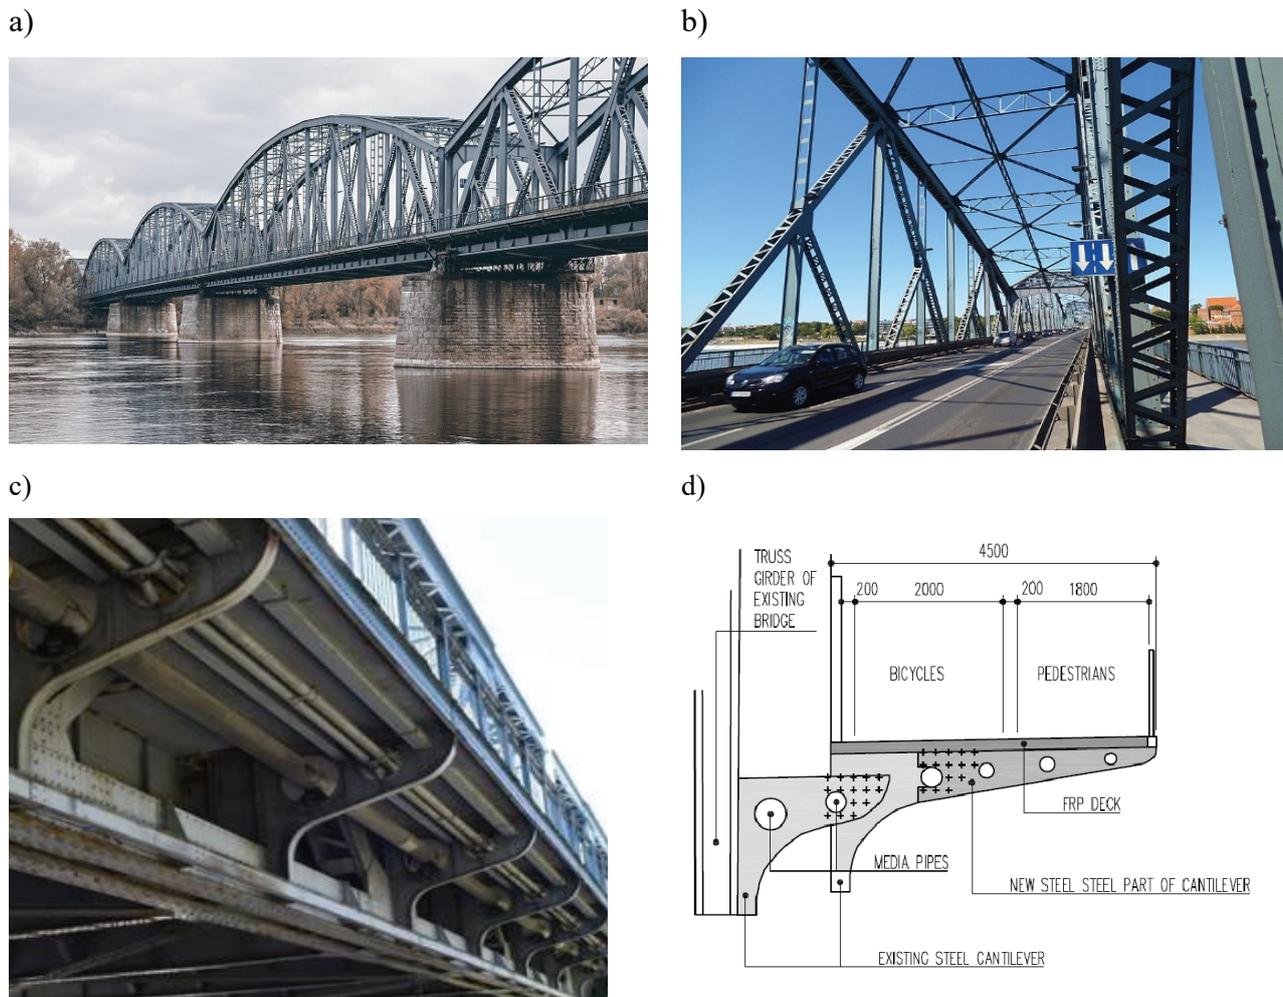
The old cantilever and cross section of the new cantilever with FRP deck [15]
